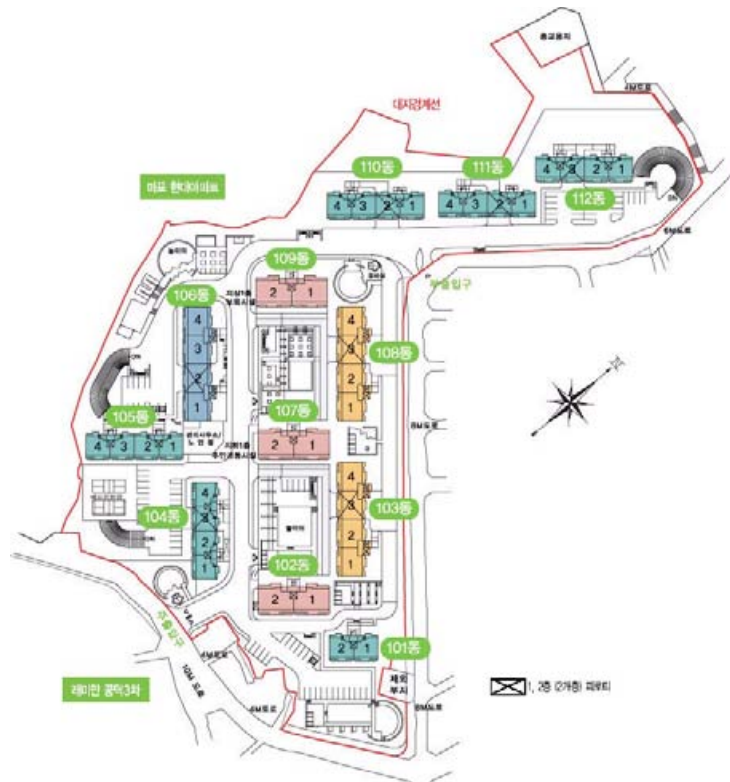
Site plan of Gongdeok R apartment estate – 1 (www.raemian.co.kr)
